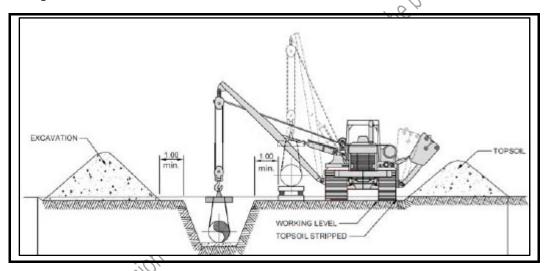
Undicative Cross Section of the Pipeline and work zone layout
